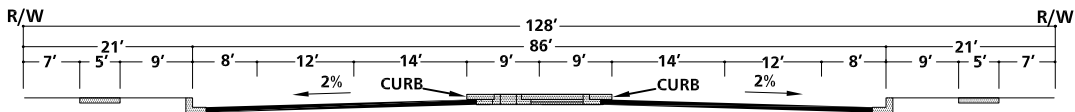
CITY OF EASTVALE GENERAL PLAN ROADWAY CROSS-SECTIONS
